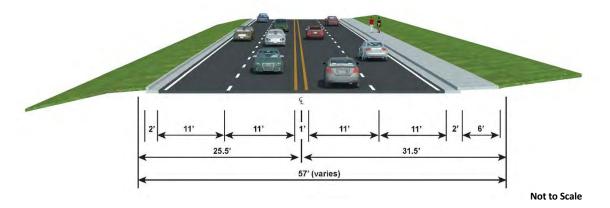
Typical Roadway Section, Urban Collector - 1 (UC-1): Dijon Drive Extension Four-Lane Roadway with Sidewalks
